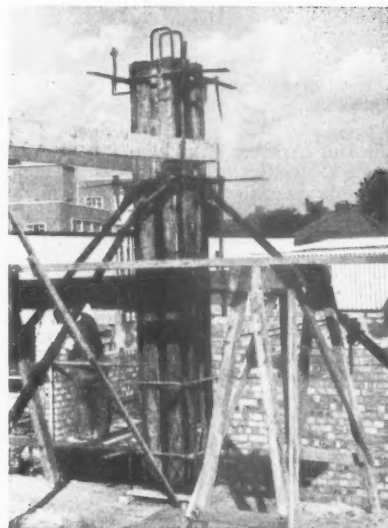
Sheet piling and supports for a column cast in situ at the new accounts block of John Laing & Son, Ltd.
